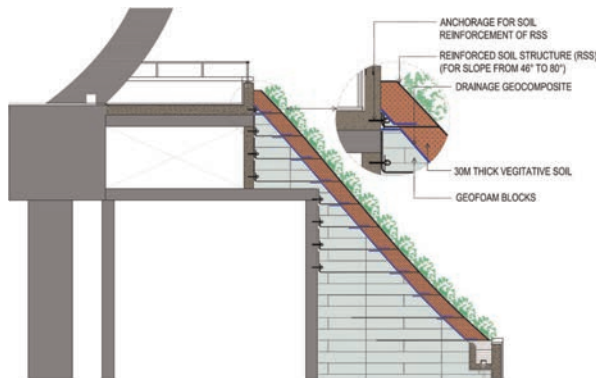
Typical cross-sectional details of geosynthetic application for steep slope (up to 80°).
